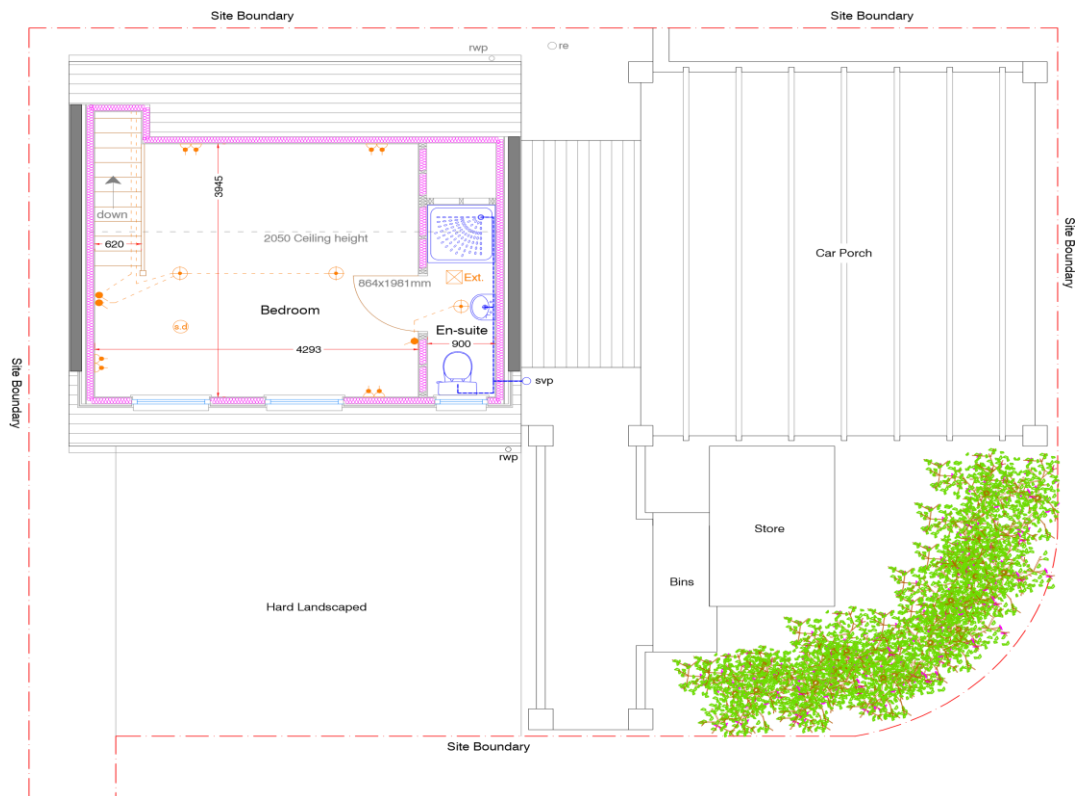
10/01898/FULL Approved upper floor plan.
